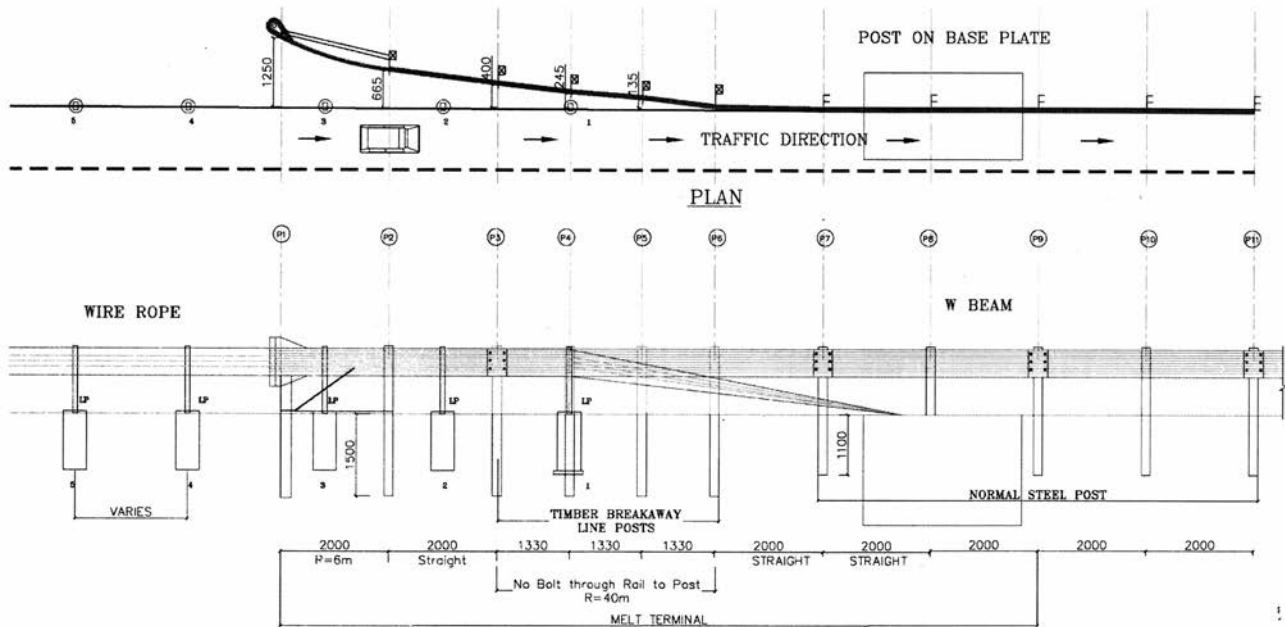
Typical Details on Wire Rope to W Beam Barrier
